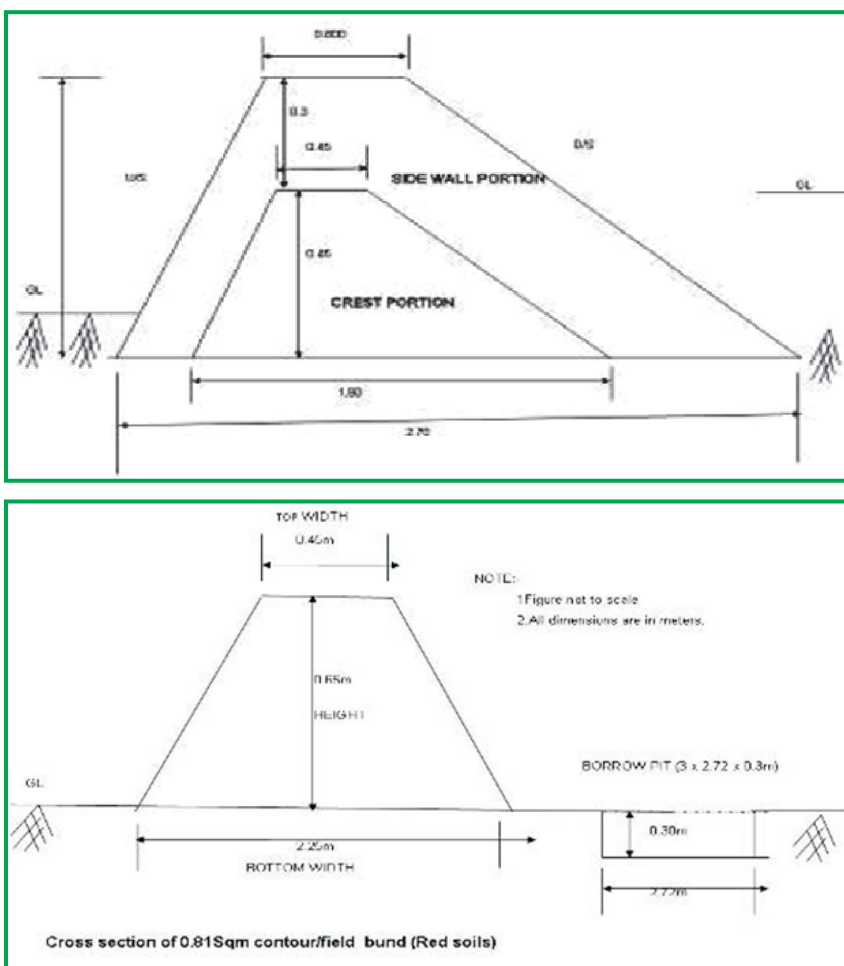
Cross section details of waste weirs and sidewalls above that of field bund and waste weir below.
